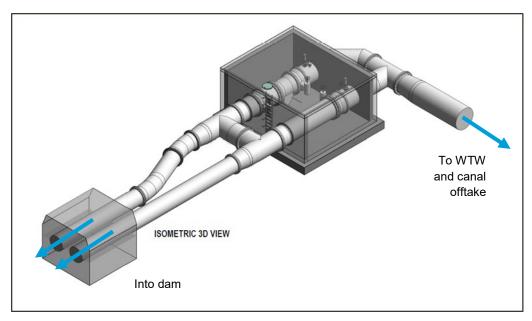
Isometric view of Coerney Dam Inlet/Outlet Chamber
